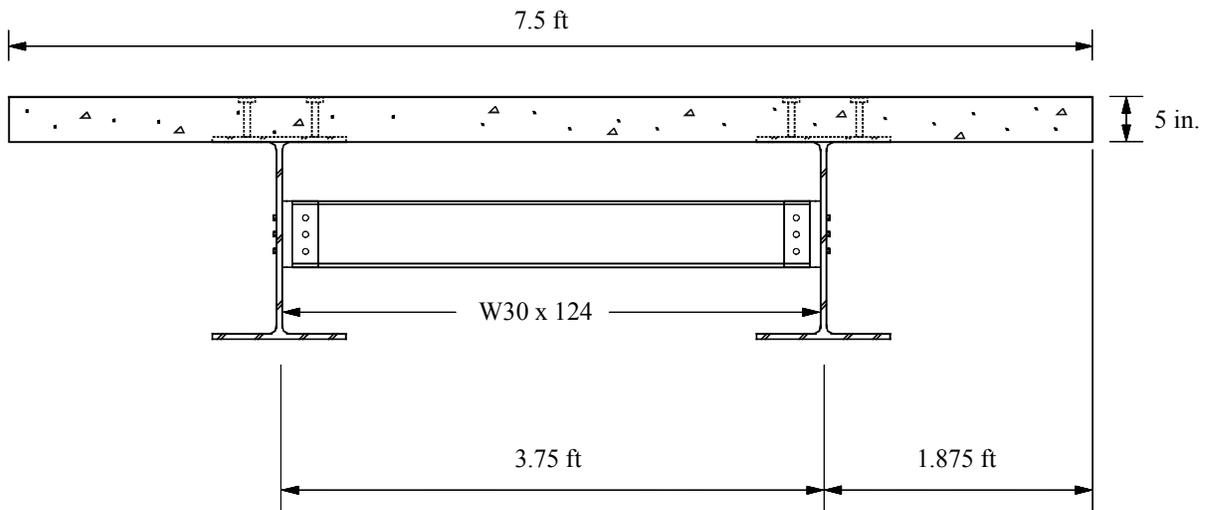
Cross section dimensions of PCDT units used in field demonstration bridge.
